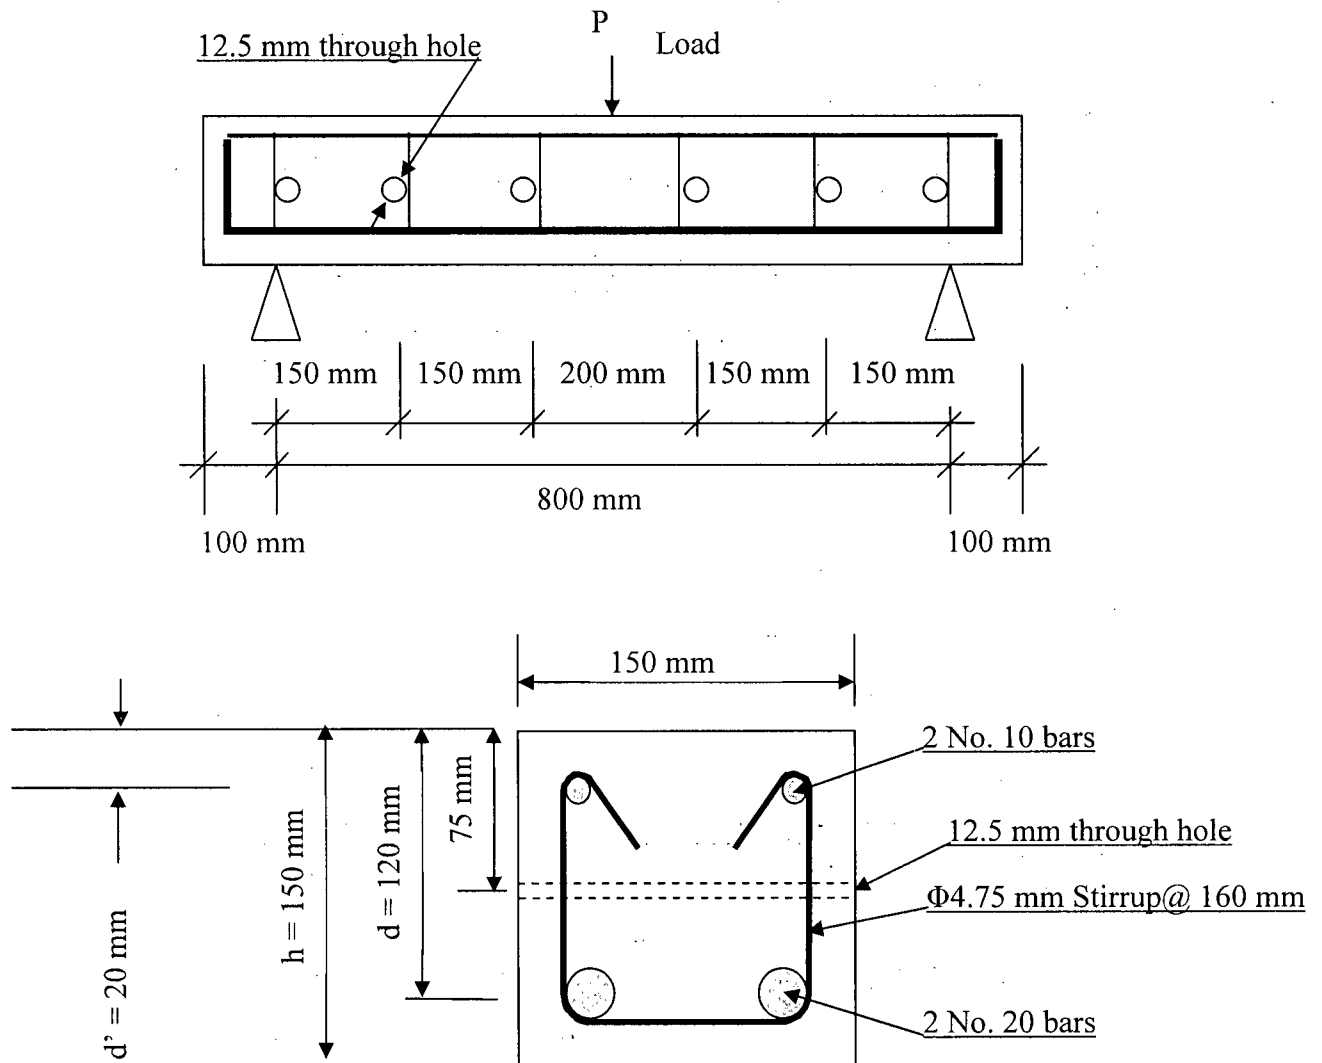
Cross-Sectional Details of RC Beam C-S-6H
